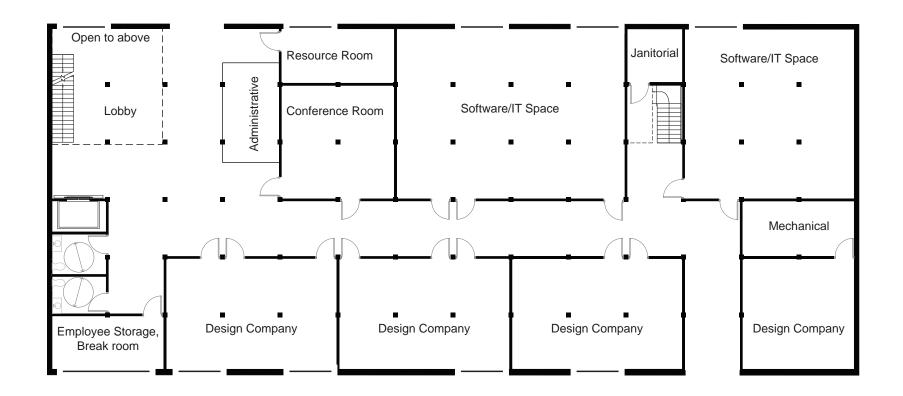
Incubator Second Floor Plan 1" = 40'
